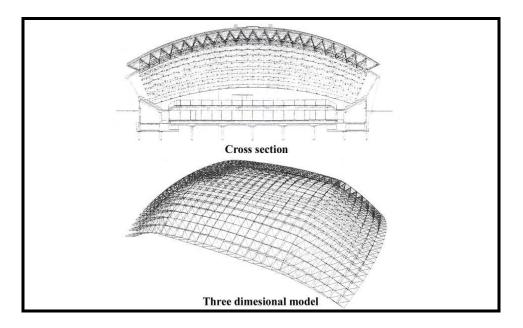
Roof structure of Oguni Dome<sup>7</sup>, Japan (Chilton, 2000:76).
